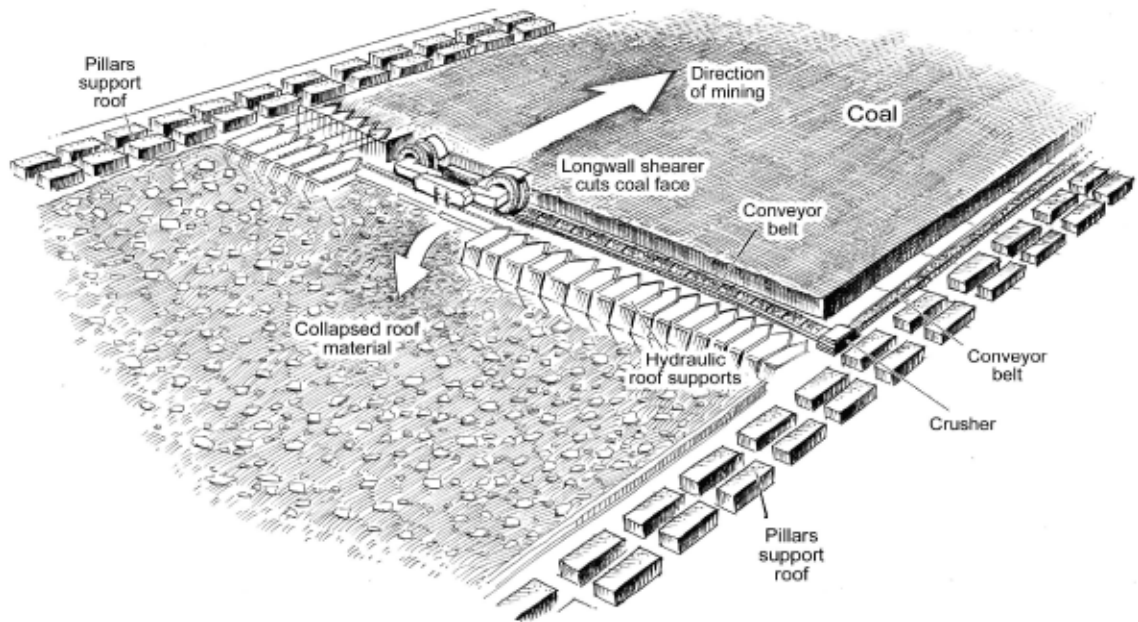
Typical schematic of longwall mining demonstrating gate entry pillars left intact to support overburden and facilitate mining process (Arch Coal, 2009)
